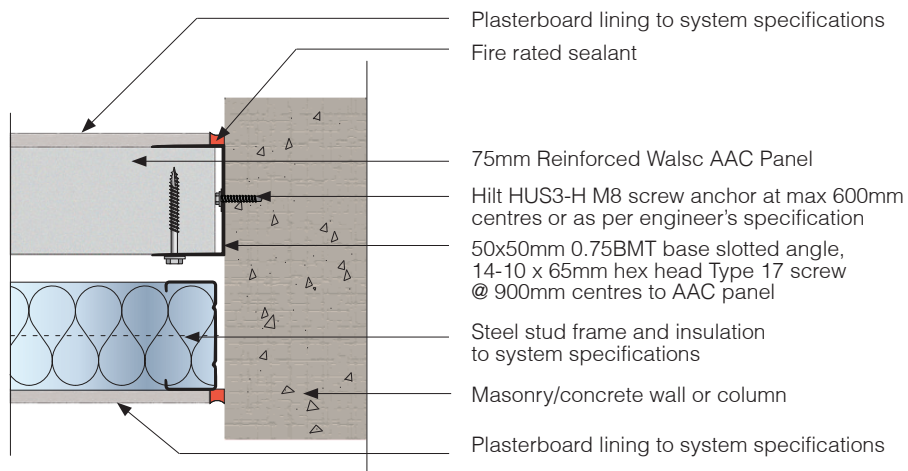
Internal Cavity Wall System Column Fixed Joint Detail
